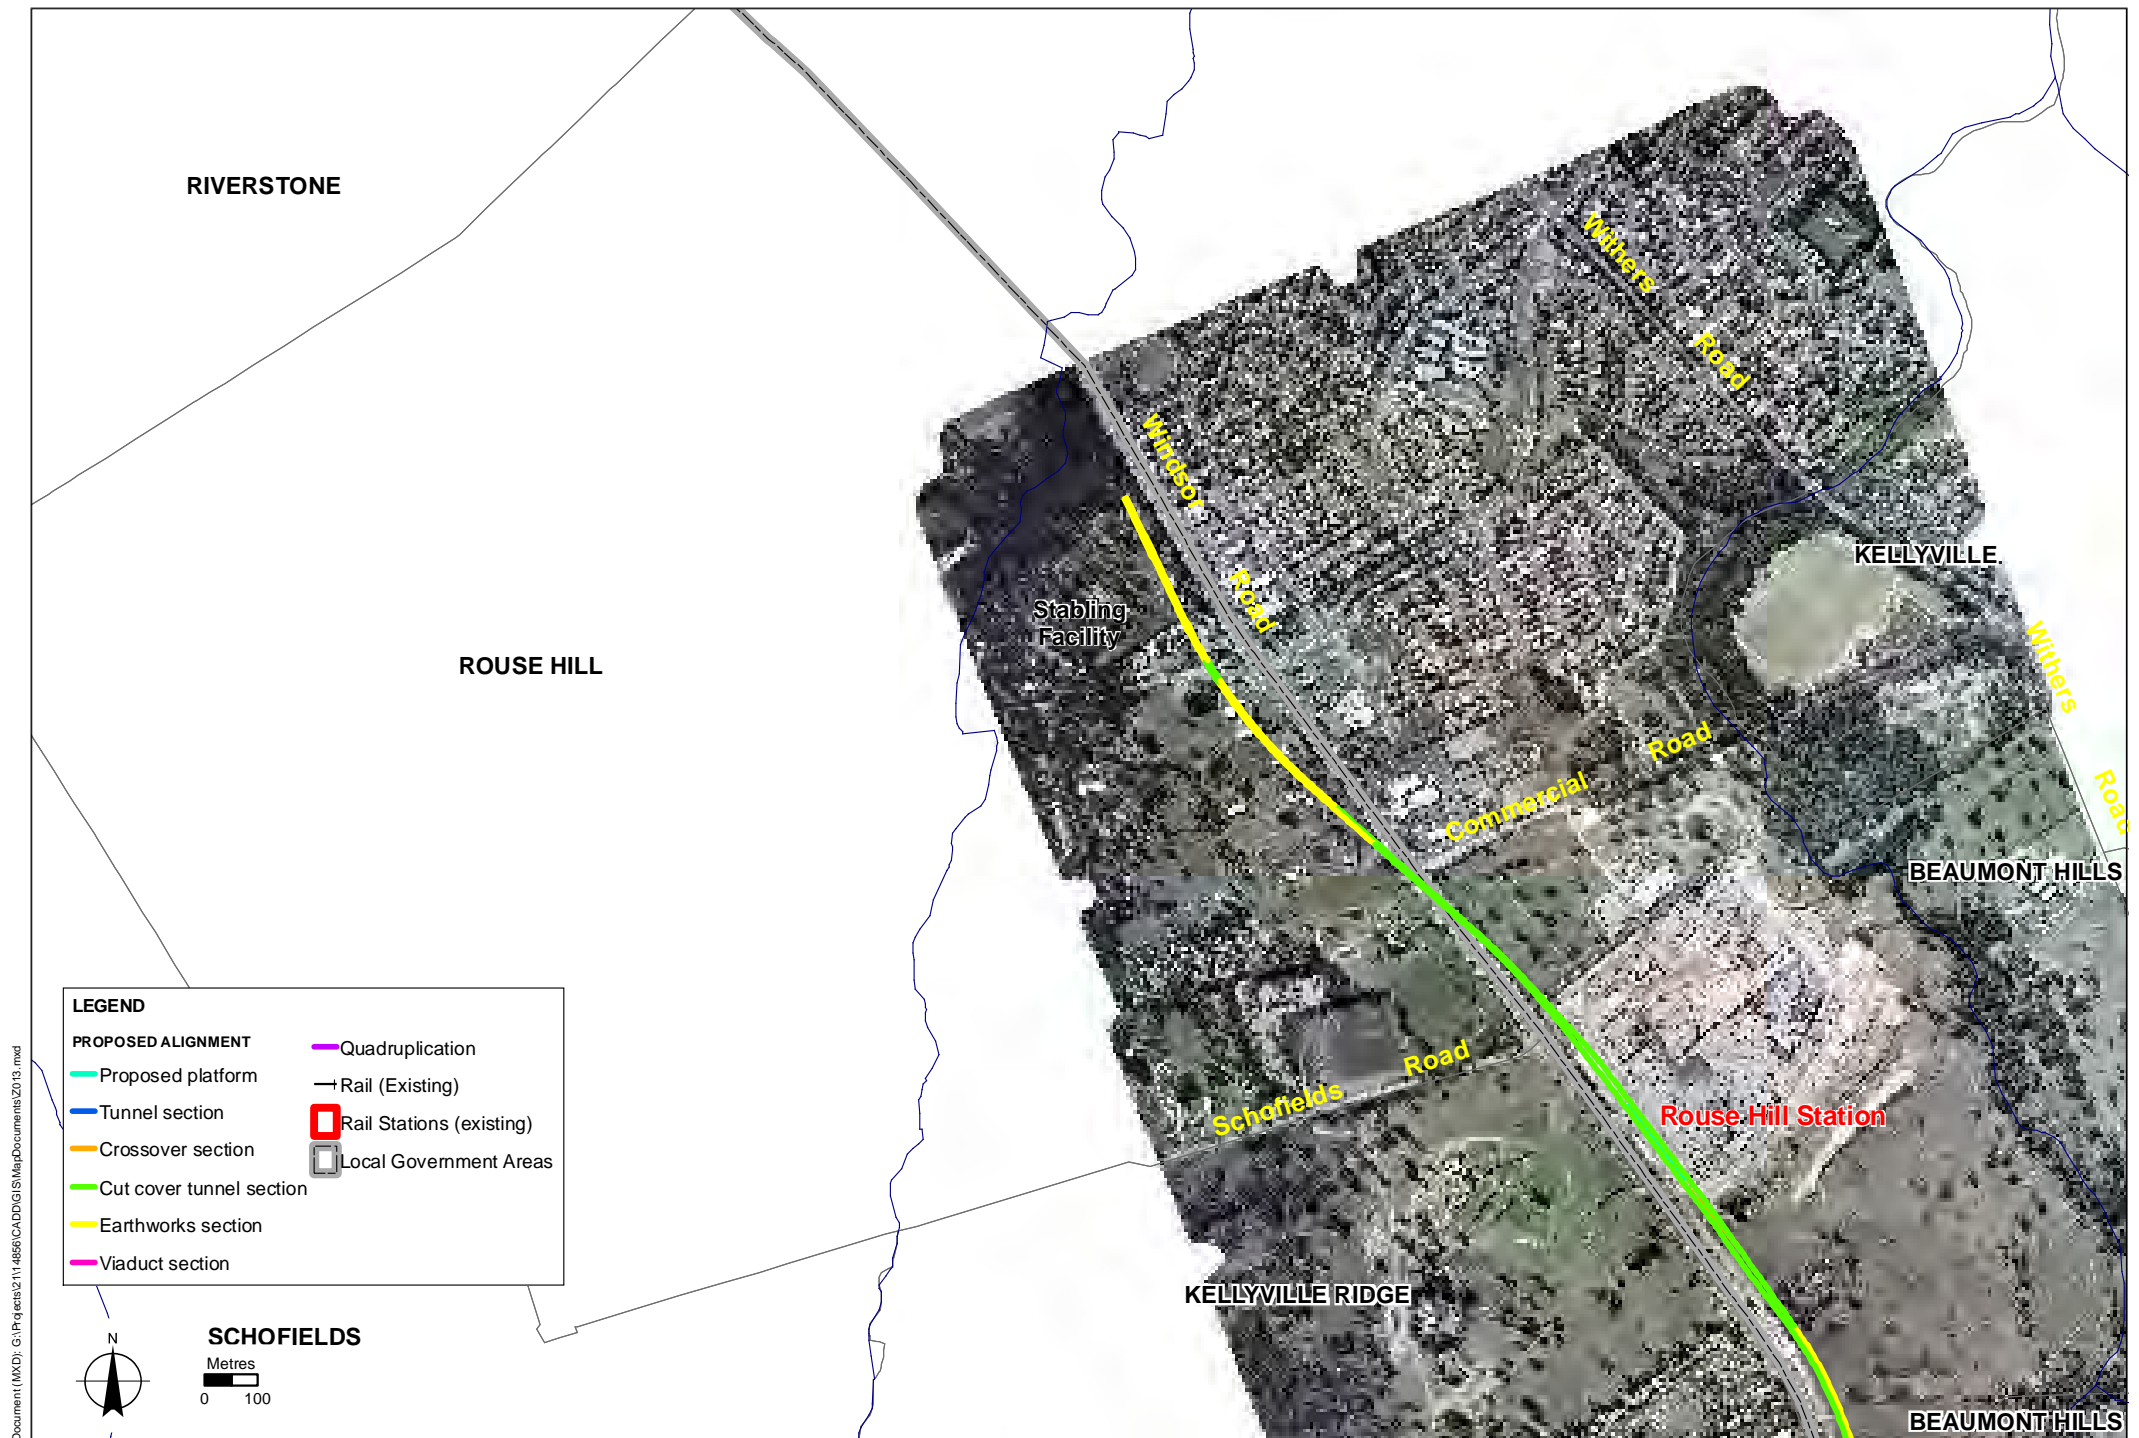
Proposed alignment - Old Windsor Road/Windsor Road intersection to Rouse Hill stabling facility
